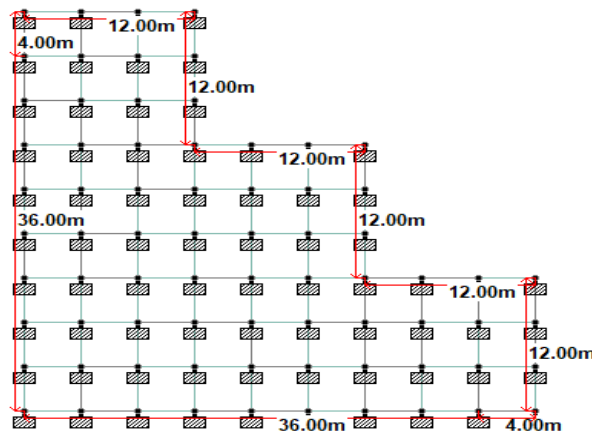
Re-entrant Plan Irregular building without Diaphragm Discontinuity
